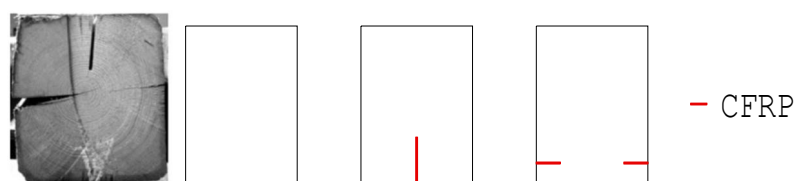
Left: cross section of historic beam as used in the research by Schober and Rautenstrauch [100]; Right: sketches of the three layouts used to reinforce the historic timber
